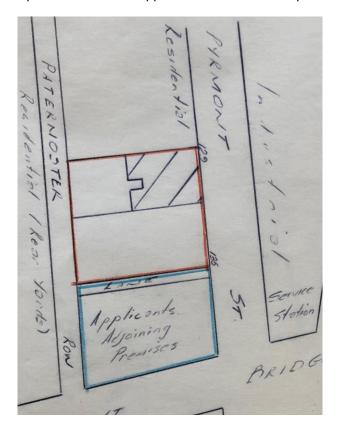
1966 – Sketch plan included in DA 974/66, showing the location of the existing Gilbey's Building in blue, with the area of the proposed new car parking area outlined in red. At the time, that site still contained terraced houses at 129-131 Pyrmont Street (Source: City of Sydney Archives, DA 974/66, '129-135 Pyrmont Street – Gilbey's Aus P/L – Proposes use of premises as a car park and for unloading the company's truck and use the remainder as a parking station')
